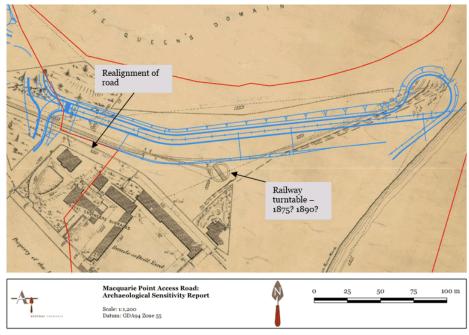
1891 plan with the turntable and road alignment indicated. Note the realignment of the road behind the Engineers Headquarters (NAA, P1330, 654, 7812383, Tasmanian Government Railways, Hobart Railway Station - plan of propose extension).
